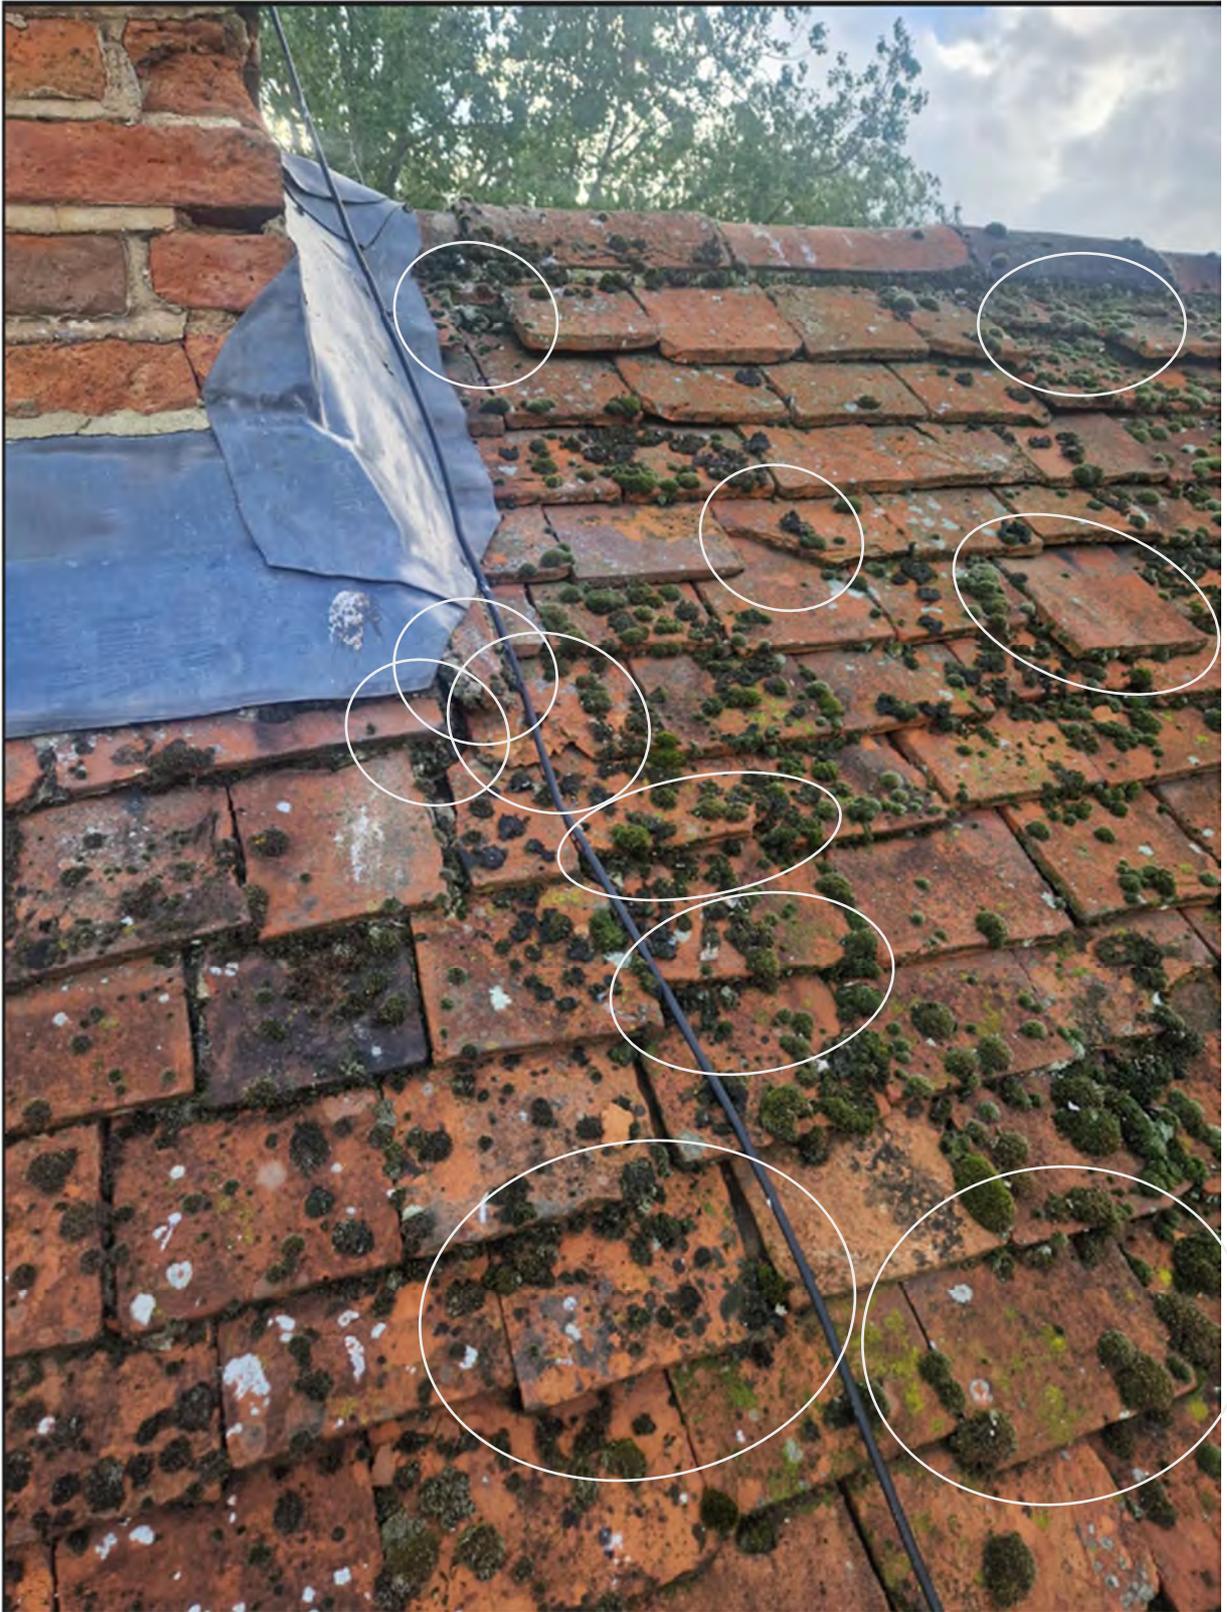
e. Above and next page- Typical tile deterioration of the main roof, cracked and missing tiles and slippage.
